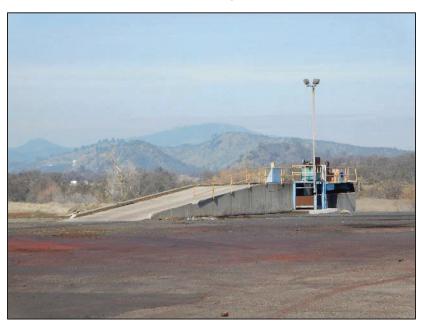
Component 8, Loading Dock, view to northwest (Dudek image DSCN7968).
